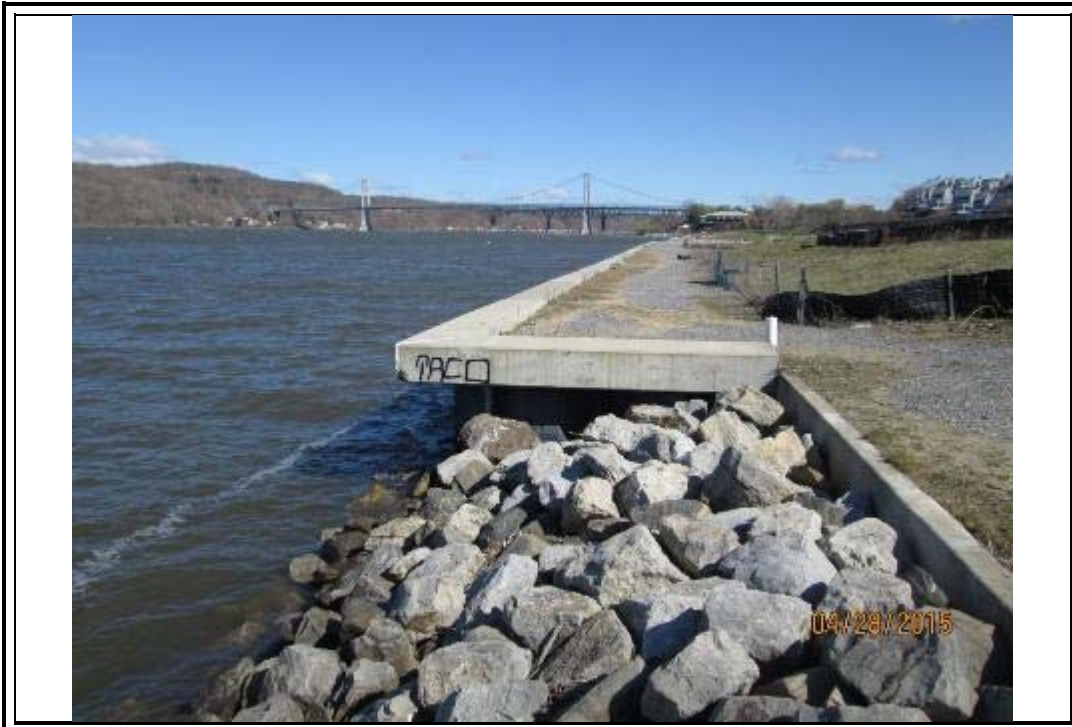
Looking south; southern end of Zone 1 bulkhead.
